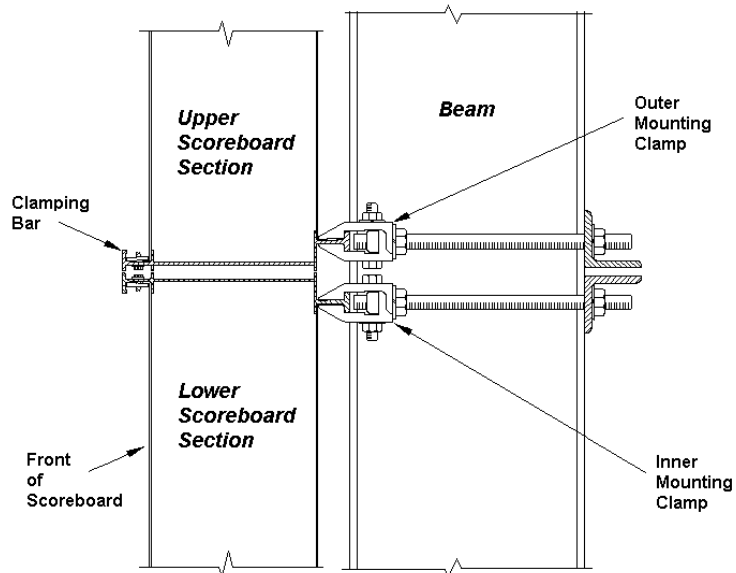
Multi-Section Scoreboard Mounting (Side View)
